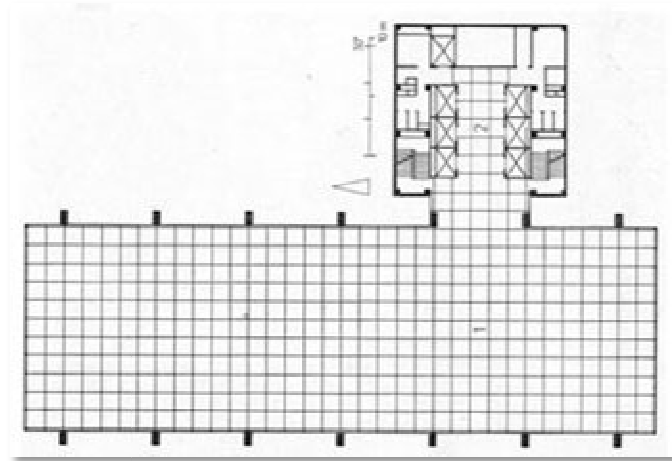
INLAND STEEL BUILDING, CHICAGO, FLOOR PLAN
